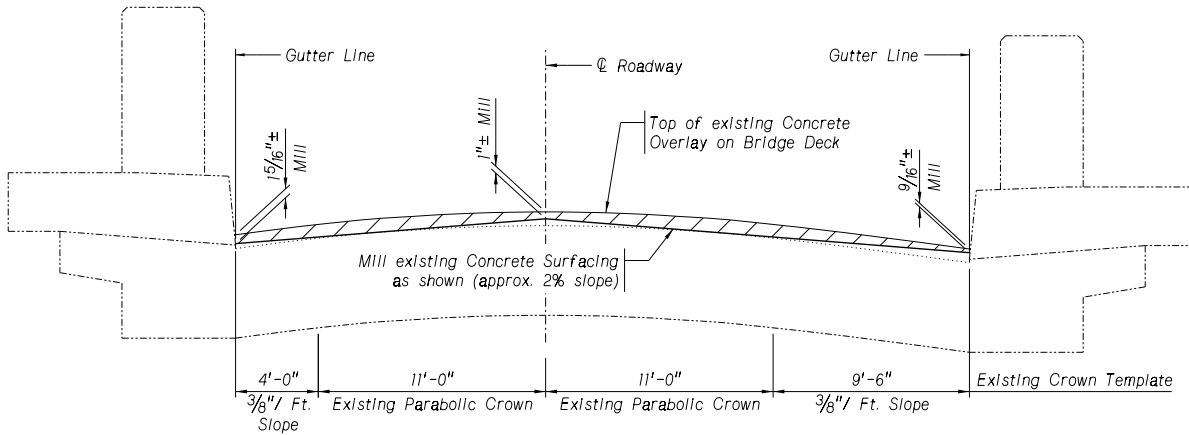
Milling of Existing Concrete Overlay for Parabolic Bridge Decks (example taken from S080 32744R, CN 42888, 2020)
